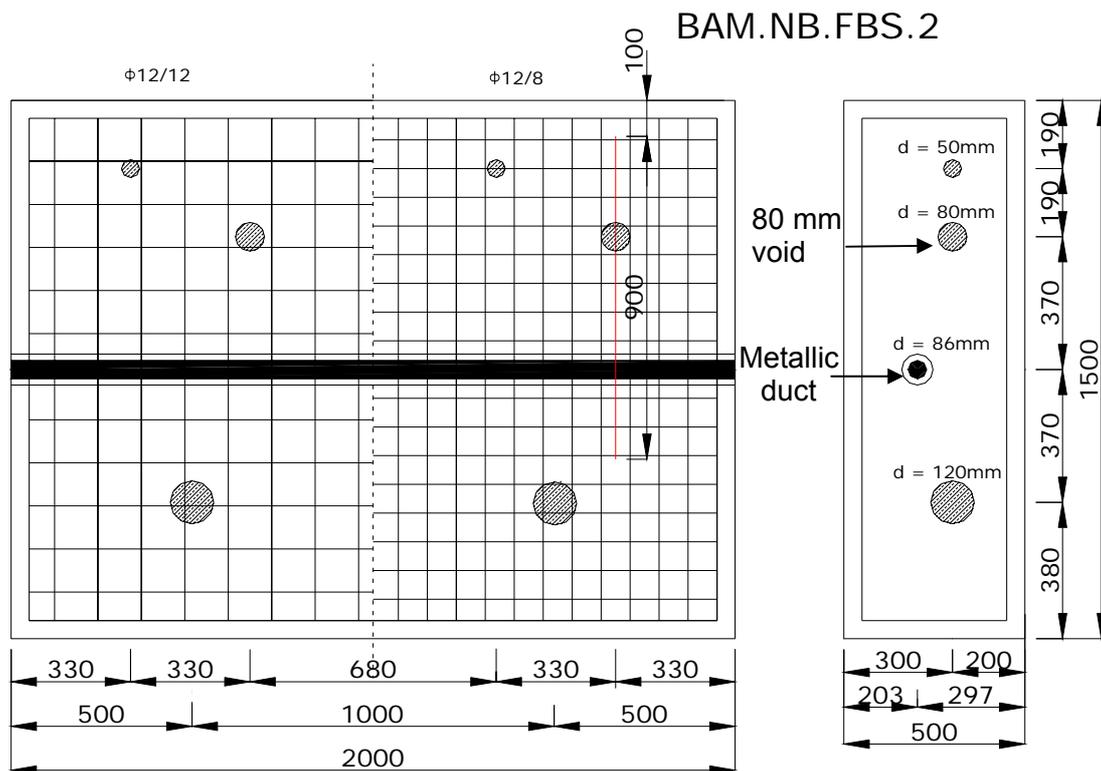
Drawing of a BAM.NB.FBS.2 concrete specimen with marked position of transmission measurements.
